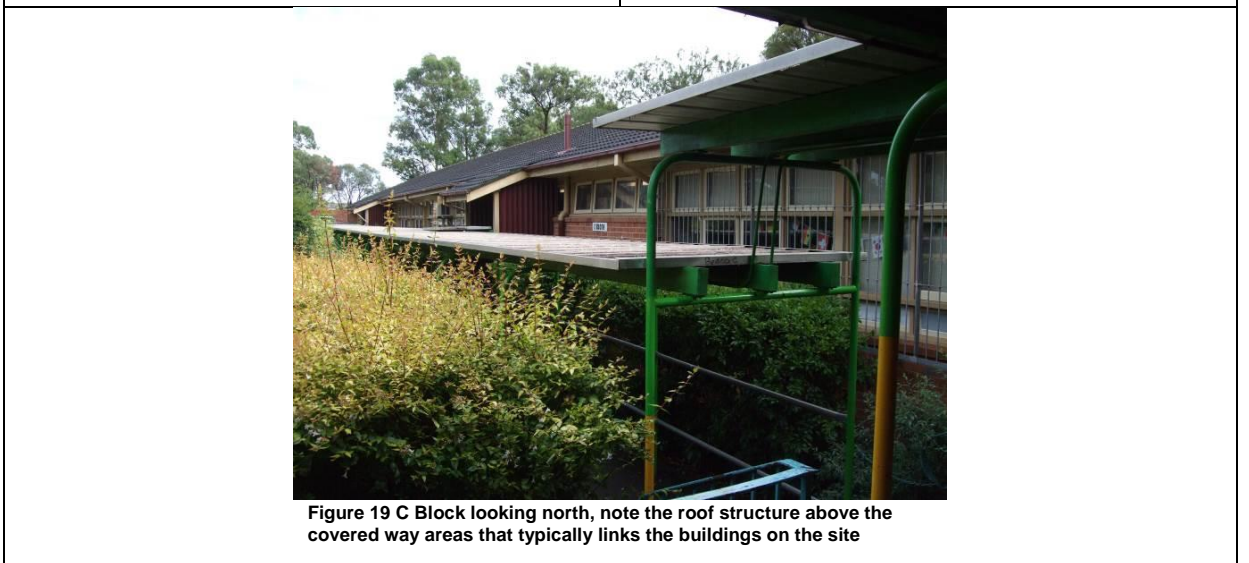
C Block looking north, note the roof structure above the covered way areas that typically links the buildings on the site
